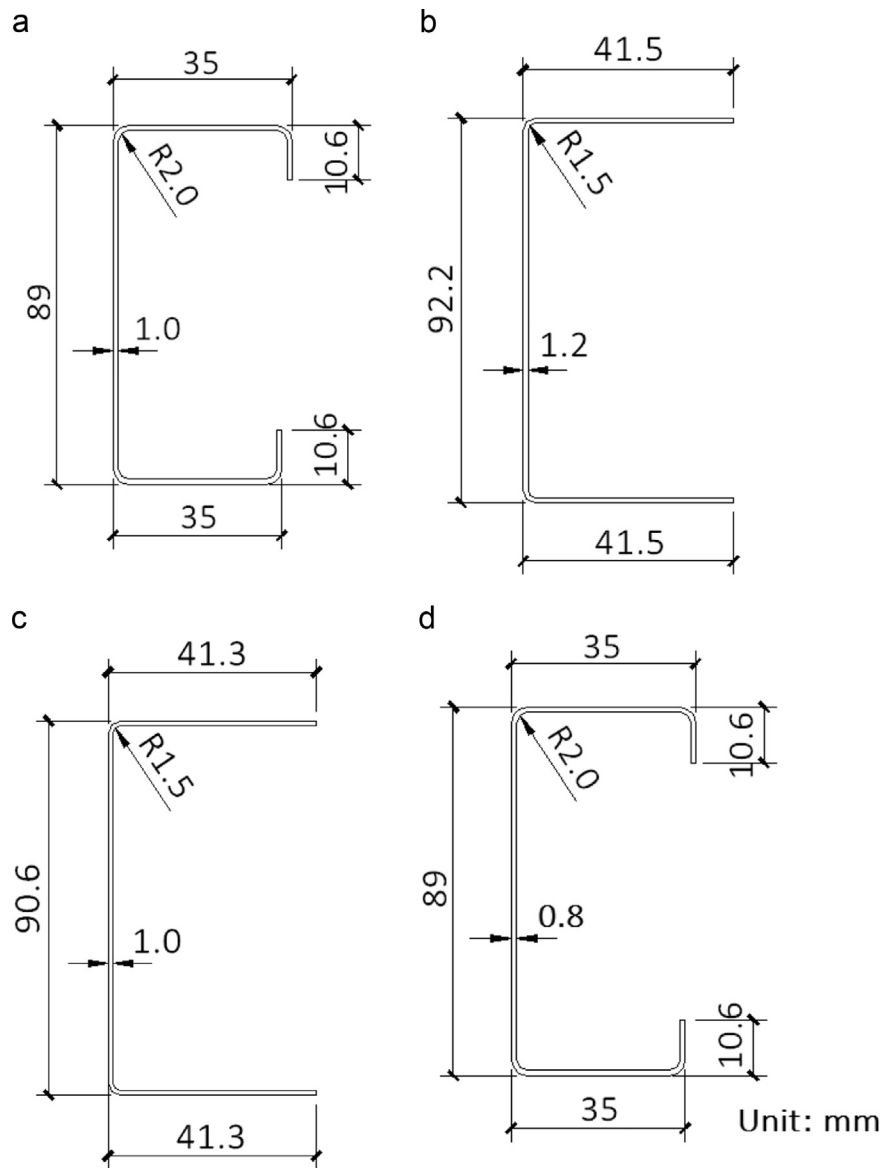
Cross-sectional dimensions of CFS frame members: (a) stud, (b) track, (c) blocking, and (d) knee element.
